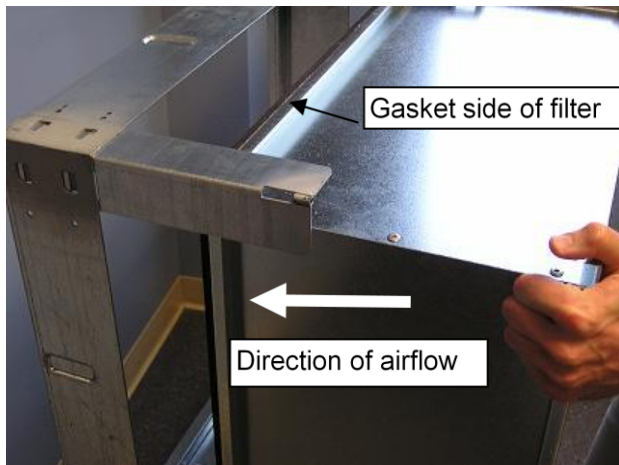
Place leg extension over the frame tabs, then pull back to lock the leg extension into place.
